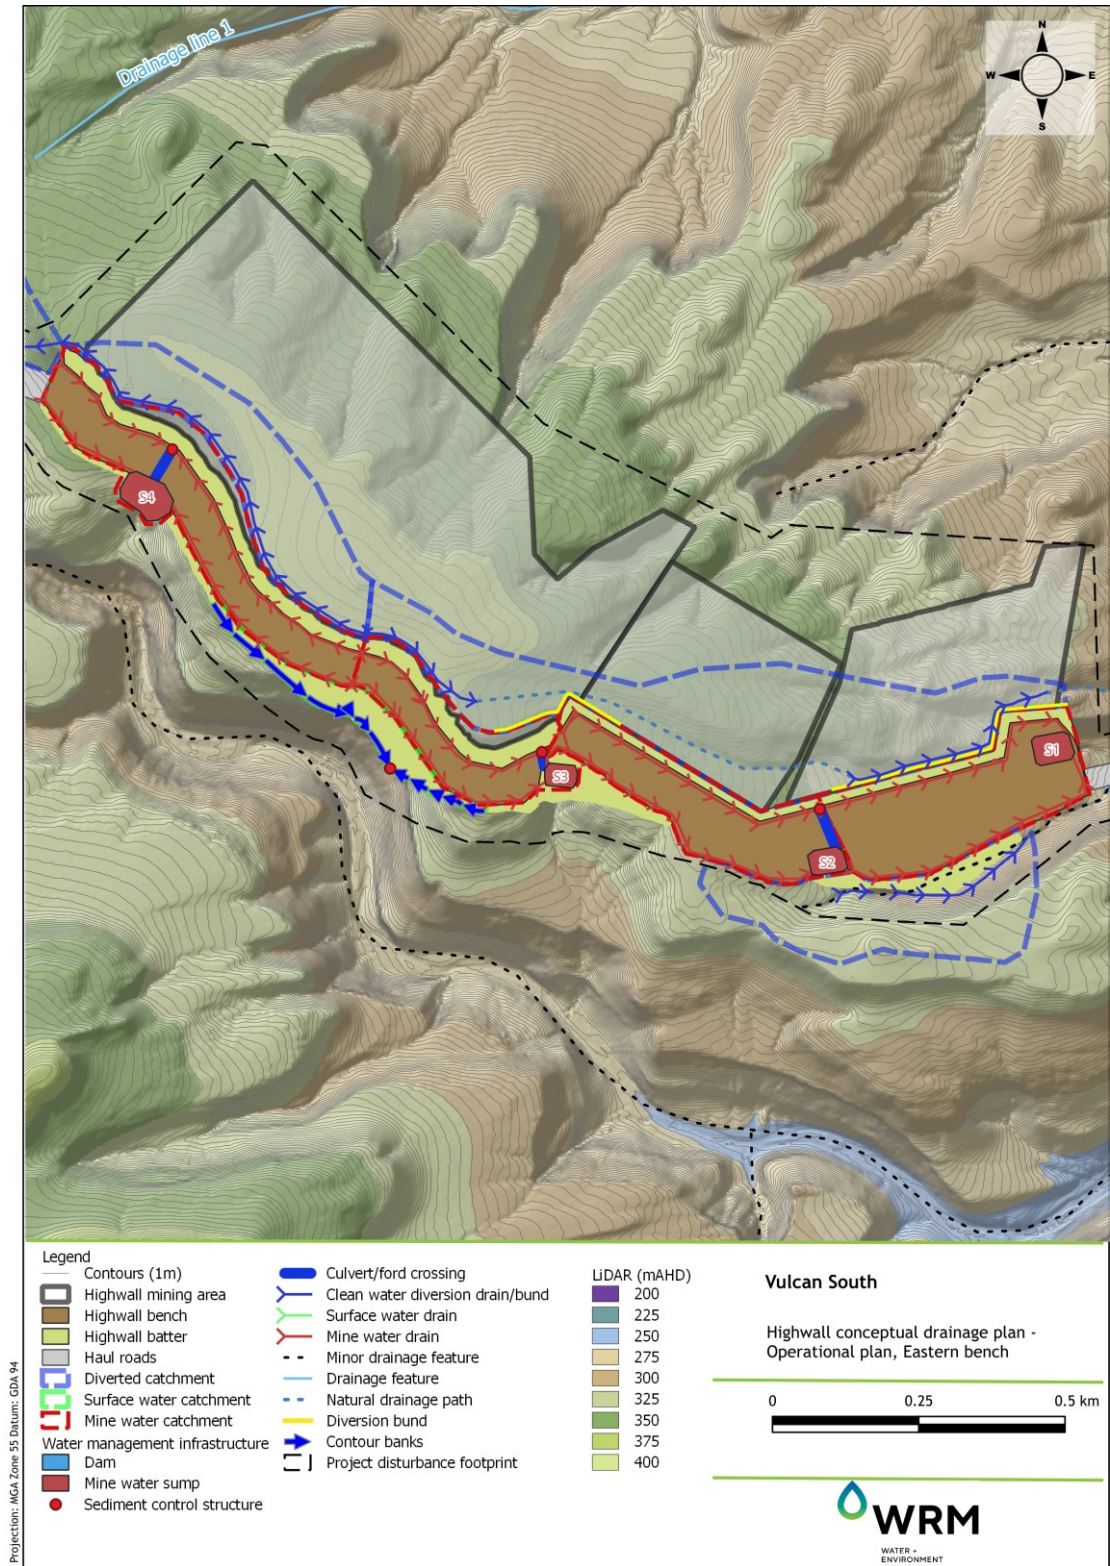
Highwall mining area east conceptual operational drainage plan
